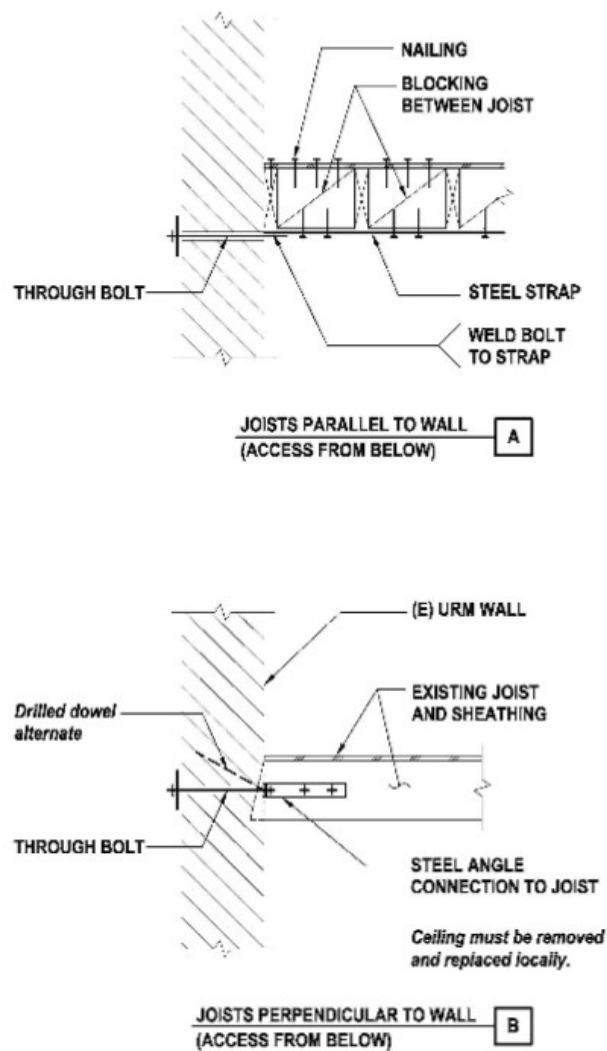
Tension Anchors Installed from Below the Floor
